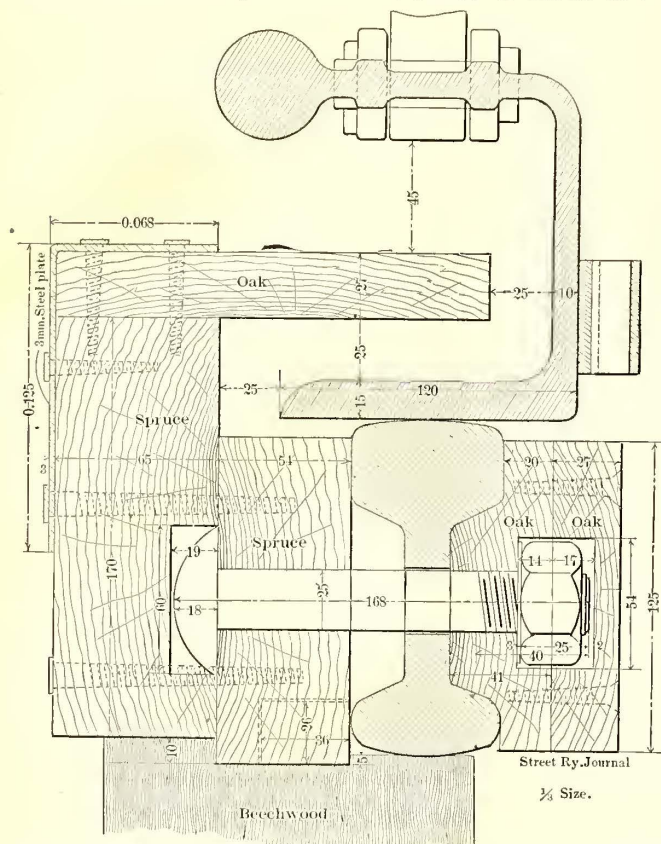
SECTION OF THIRD-RAIL CONSTRUCTION USED IN STATIONS
